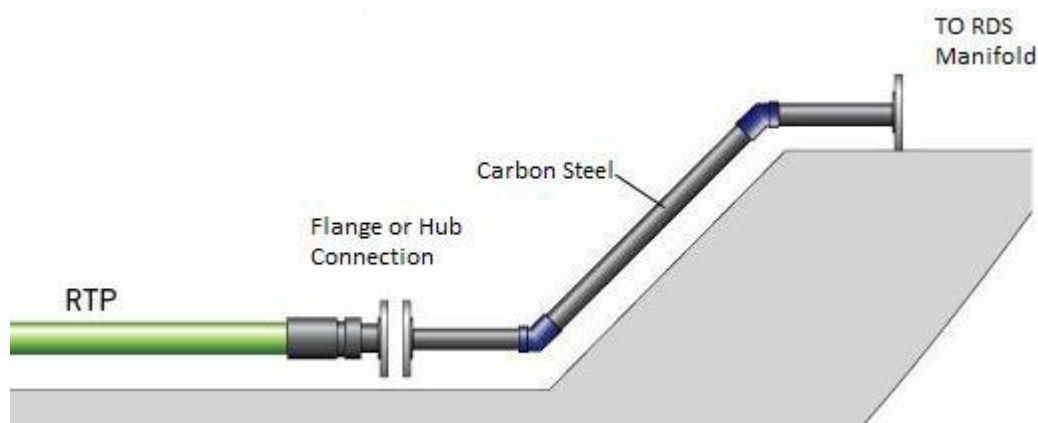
RTP Approach Connectivity (Outside the Fence)
